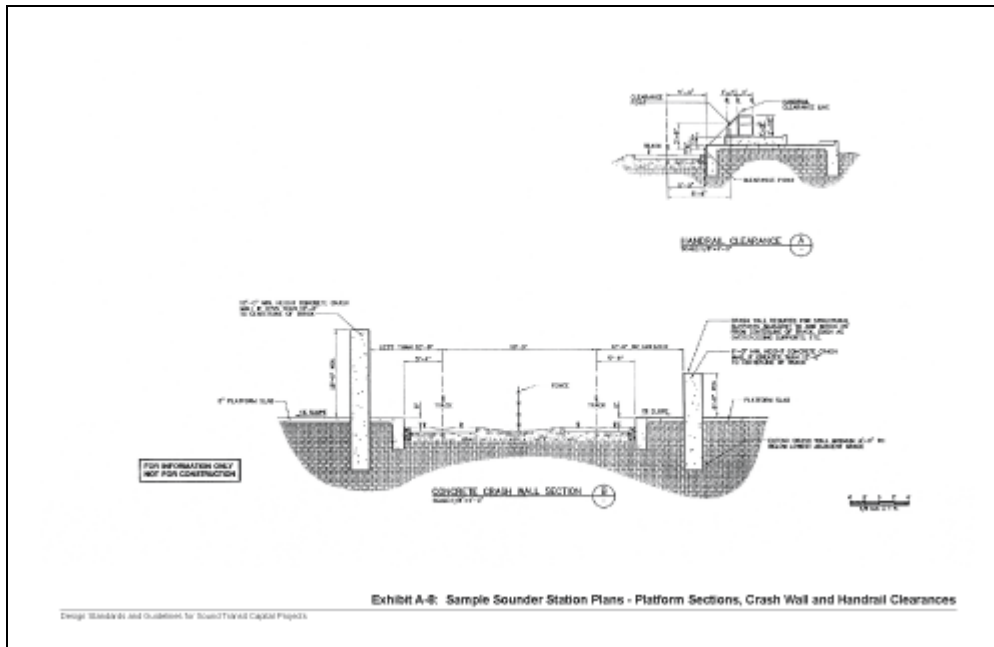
Sample Sounder Station Plans – Platform Sections, Crash Wall and Handrail Clearances (772 KB)
